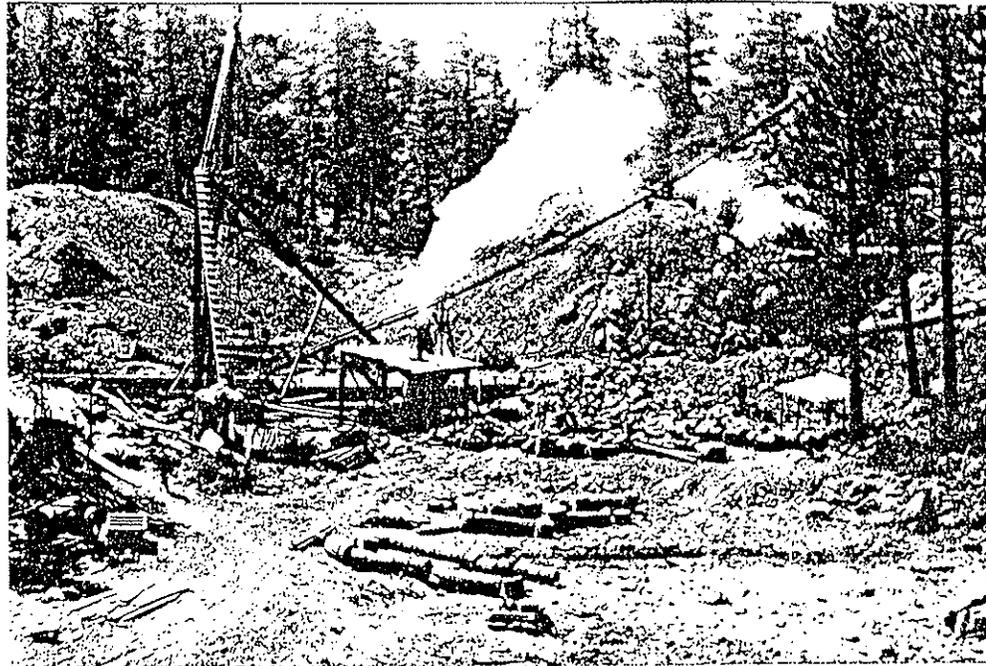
Steam engine and foundation work for Gerber Dam, September 5, 1924. (Bureau of Reclamation Photo No. 548).
